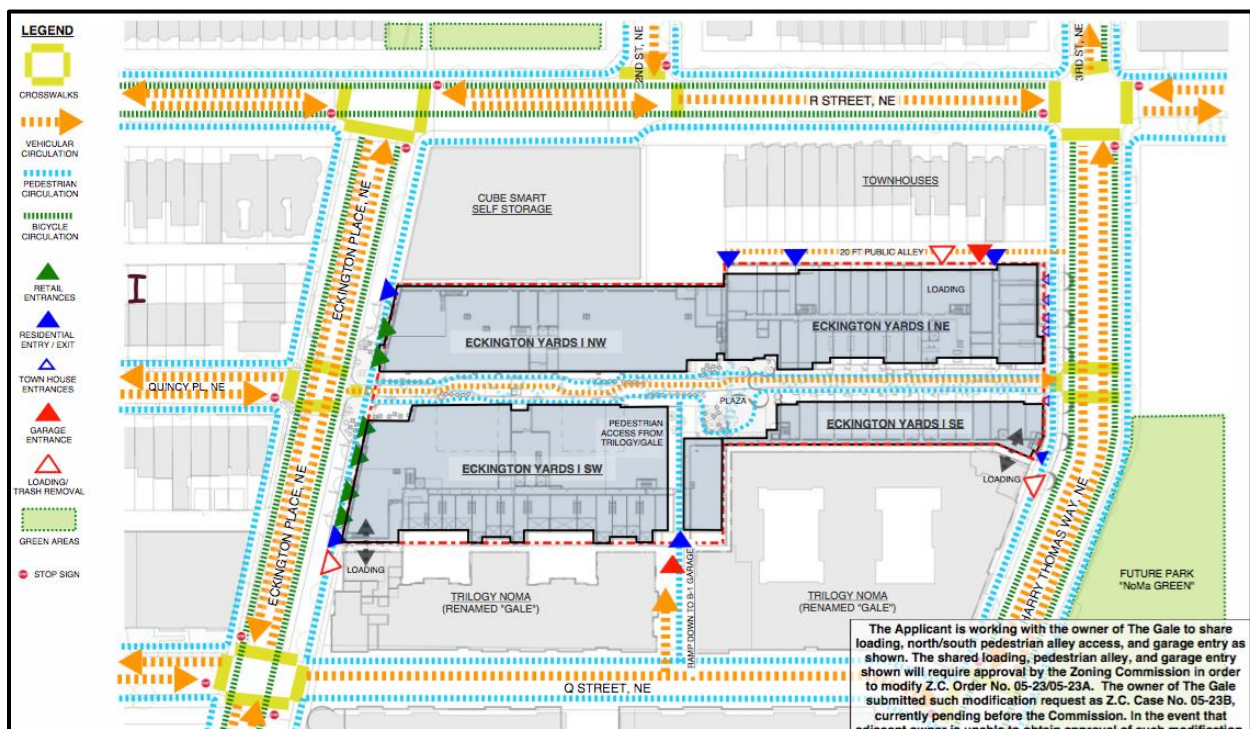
Applicant's Preferred Circulation and Parking/Loading Entrance Alternative
